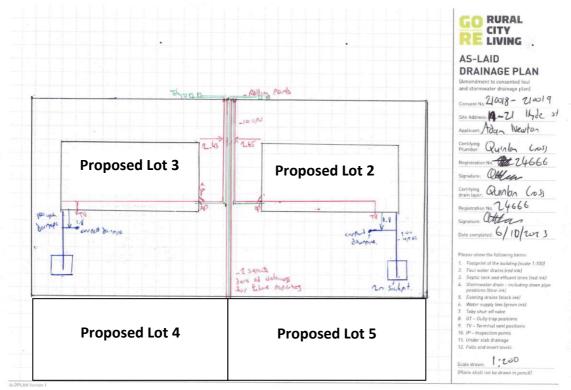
As-Laid Drainage plan showing four individual services connections to the four individual lots.
